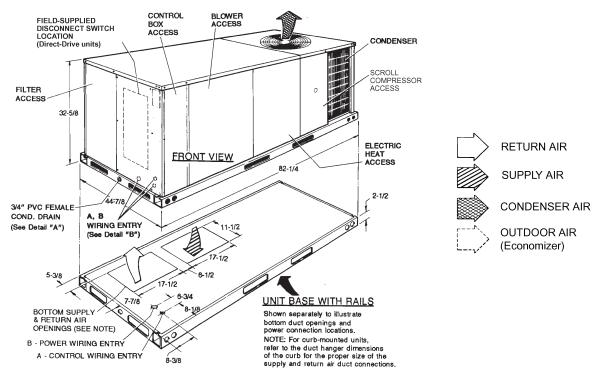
XP036-060 Heat Pump/Electric Heat Front View Physical Dimensions
